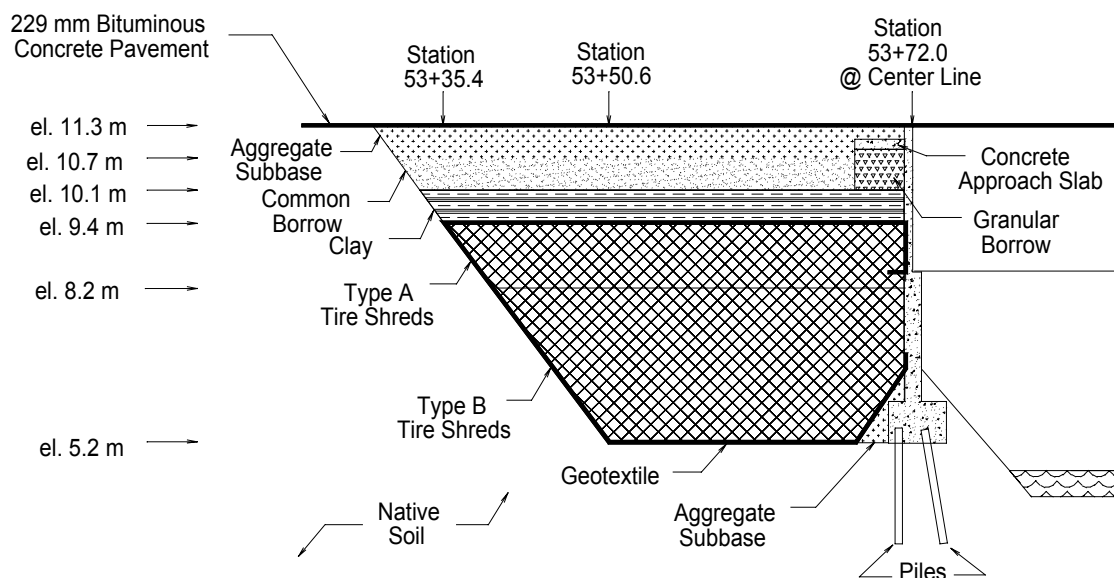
Cross section through north abutment of Merrymeeting Bridge in Topsham, Maine.
